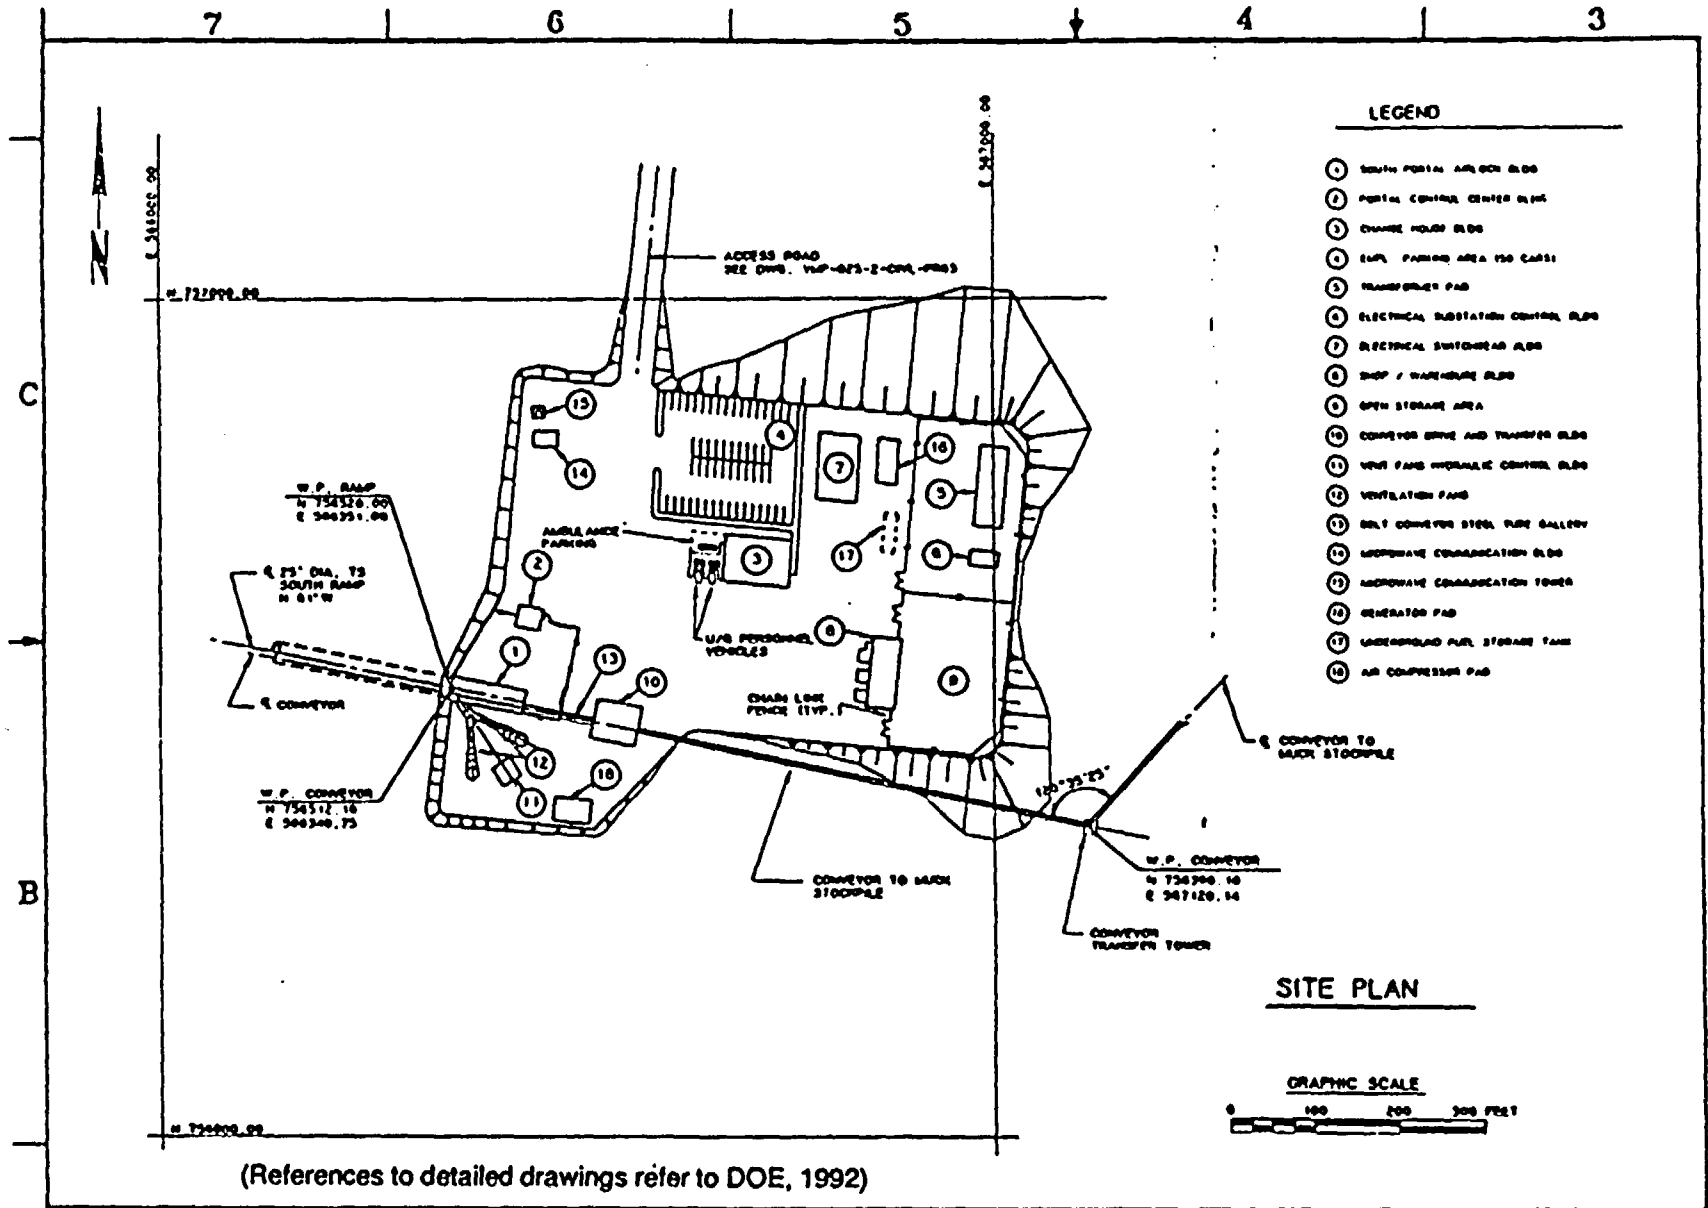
South Portal Surface Site Plan. (Modified from DOE, 1992; Drawing No. YMP-025-2-CIVL-PL01)
